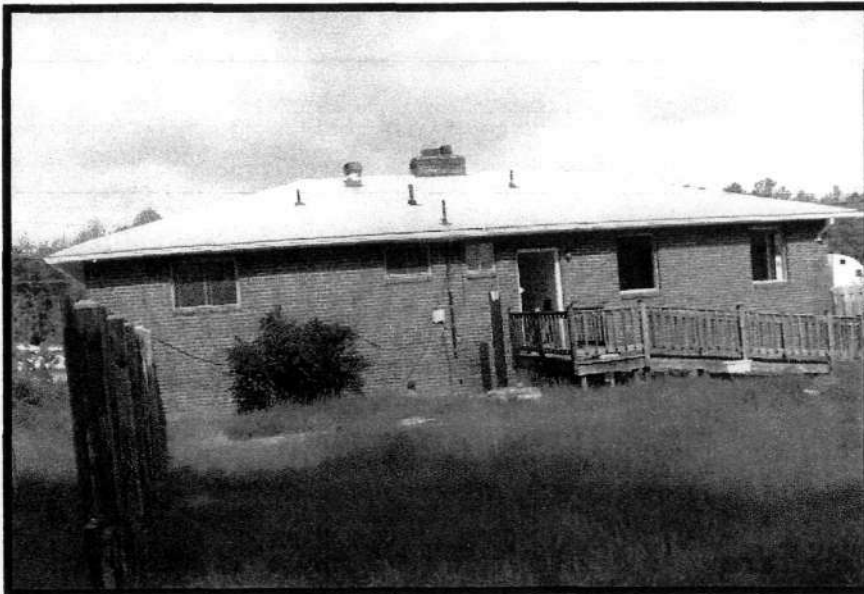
15508 Crain Highway. Rear Façade. View to the West.
